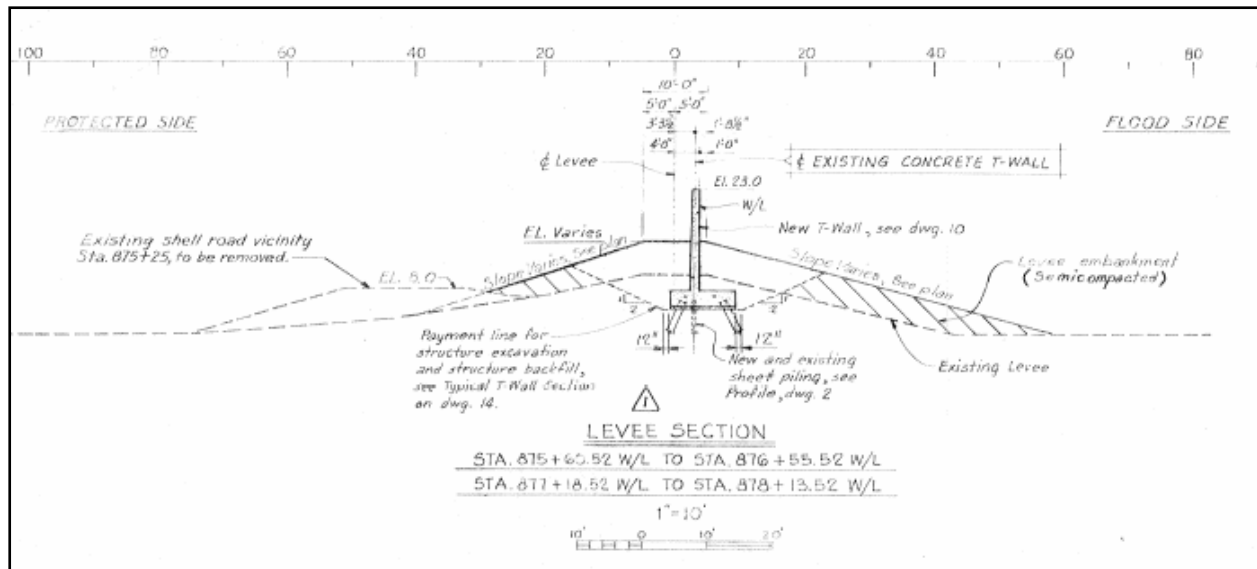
NOE2_H Newer (1977) Cut and Fill Sections for T-Wall, Same Contract as Above
